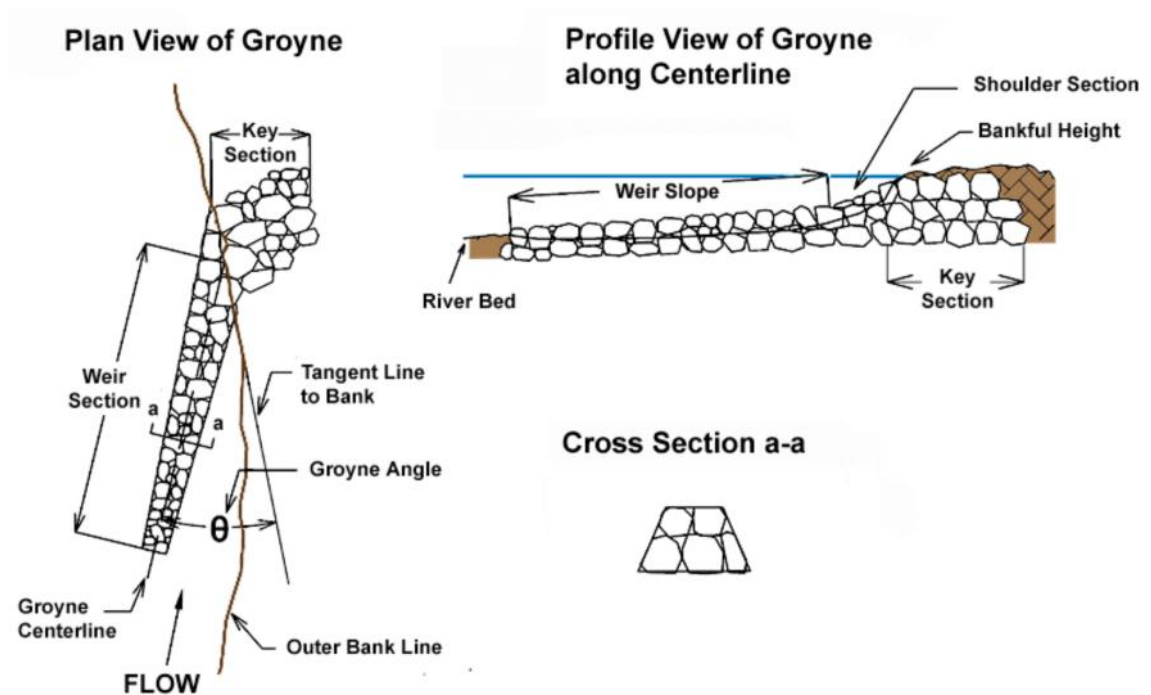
Plan, profile, and cross section views of typical spur used for bank protection
